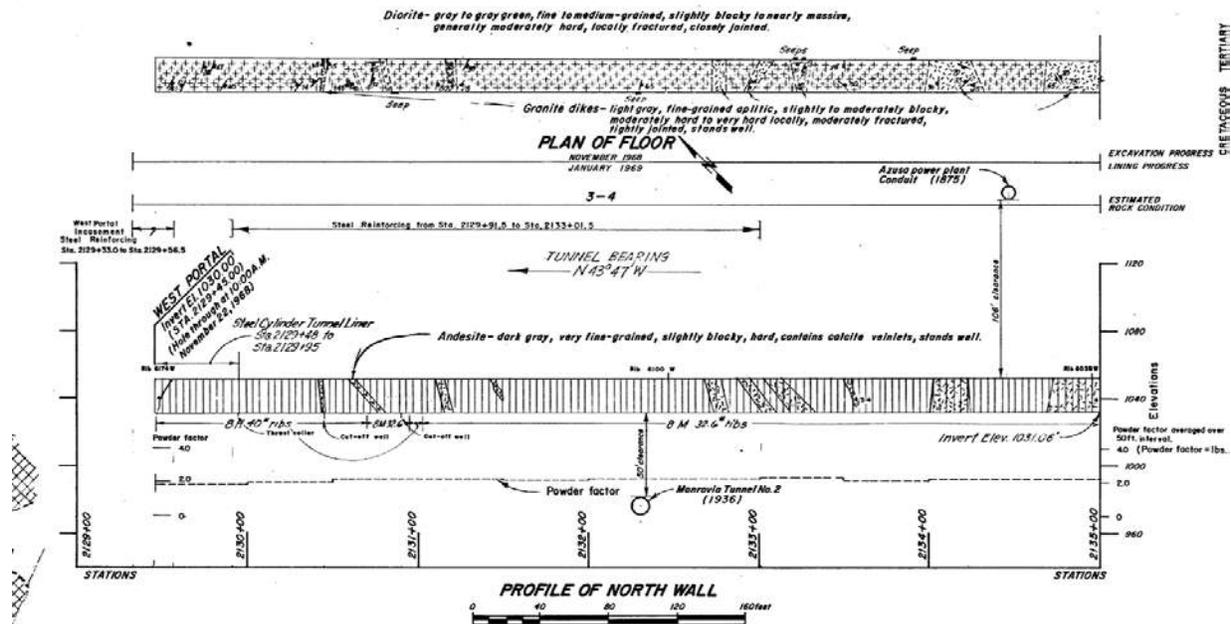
Section of Glendora Tunnel Near alignment documenting rock conditions
